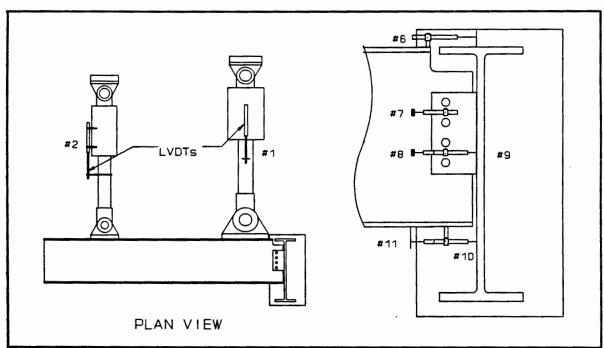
Blow Up of Girder Area and LVDT Placement
